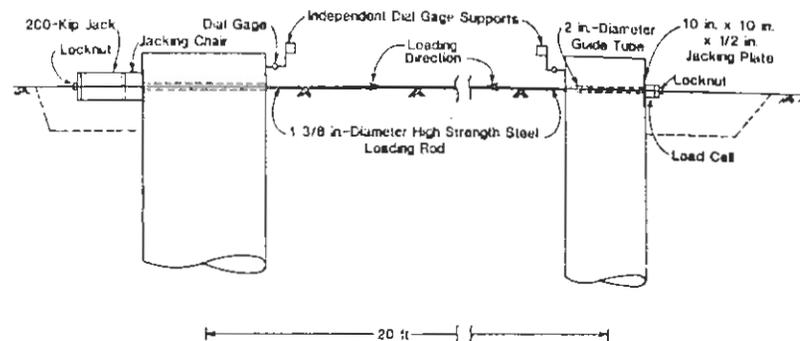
SCHEMATIC TEST SET UP - PIERS 4 TO 7
